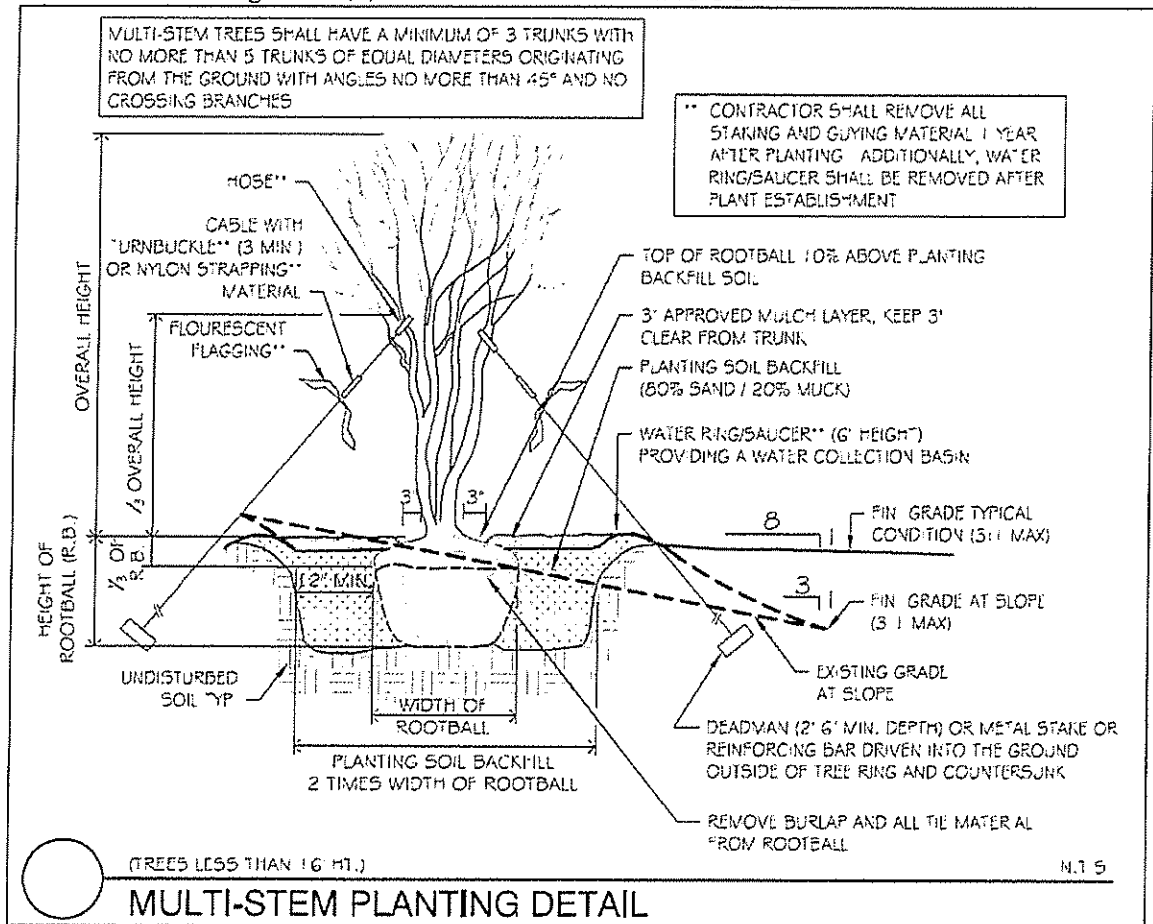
(B) – MULTI-STEM PLANTING DETAIL
